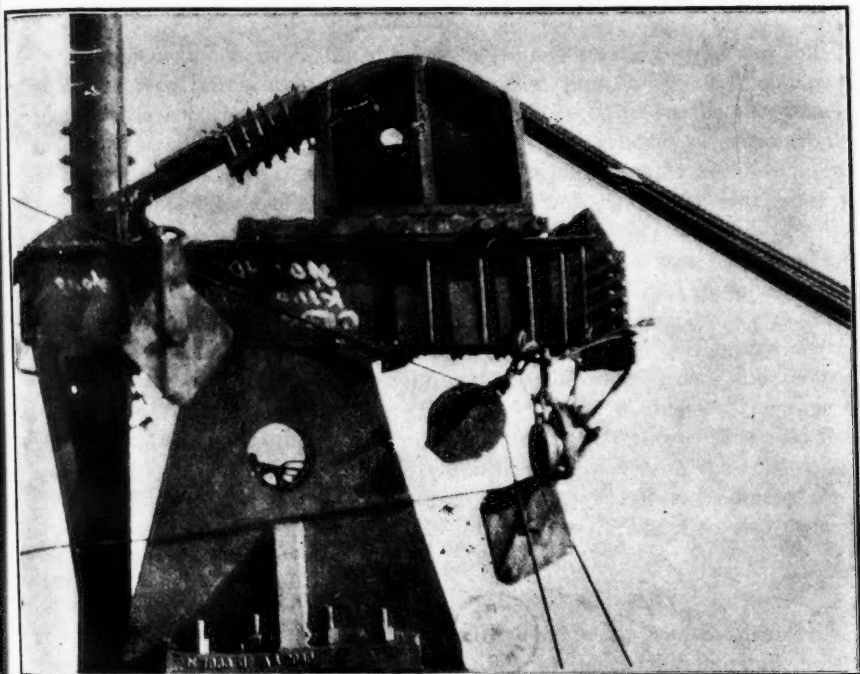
ERECTION ROPE SHOES BEFORE LOADING THE ROPES, FLORIANOPOLIS BRIDGE.
